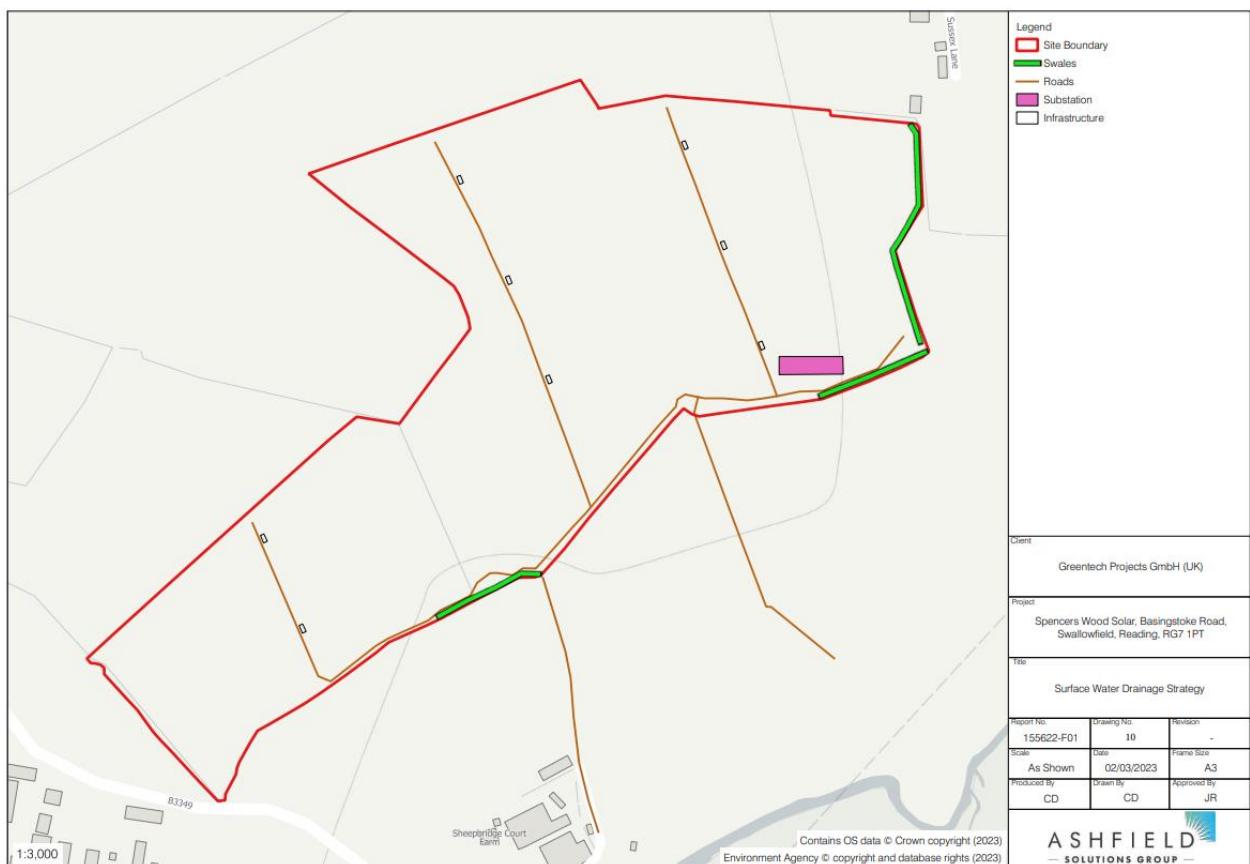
Plan 155622-F01 showing the location of proposed swales in green.
